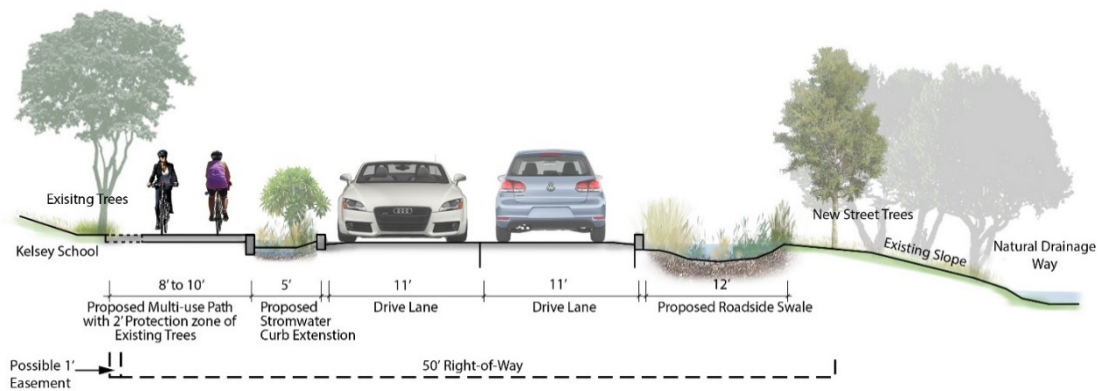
Section B-B – Proposed Street Cross Section (By author)
